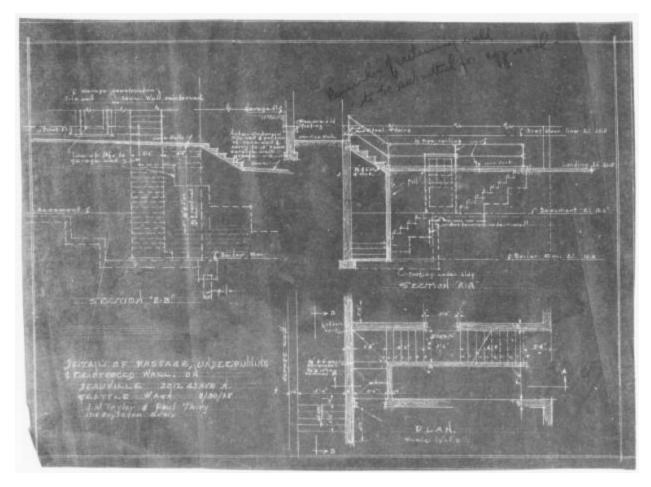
"Detail of Passage Underpinning & Reinforced Wall on Beauville. 2012 43rd Ave N [...] 11/30/28 J.M. Taylor & Paul Thiry"
